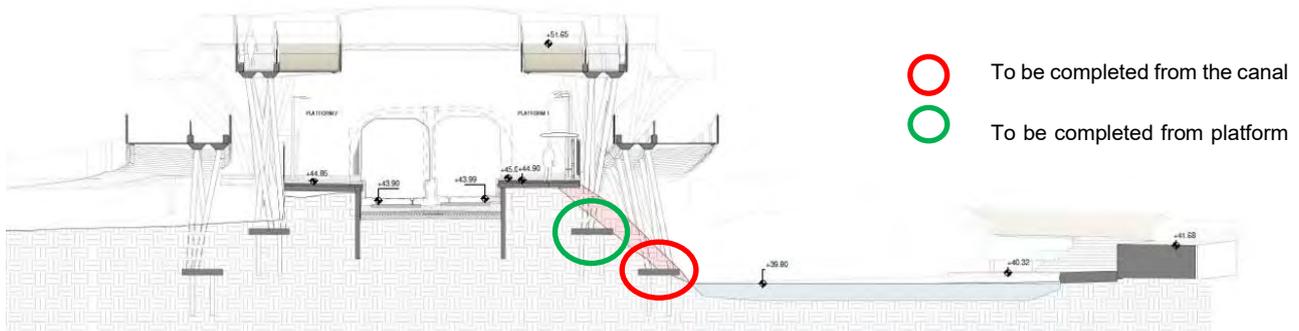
Section through Ashtown pedestrian bridge showing foundations
